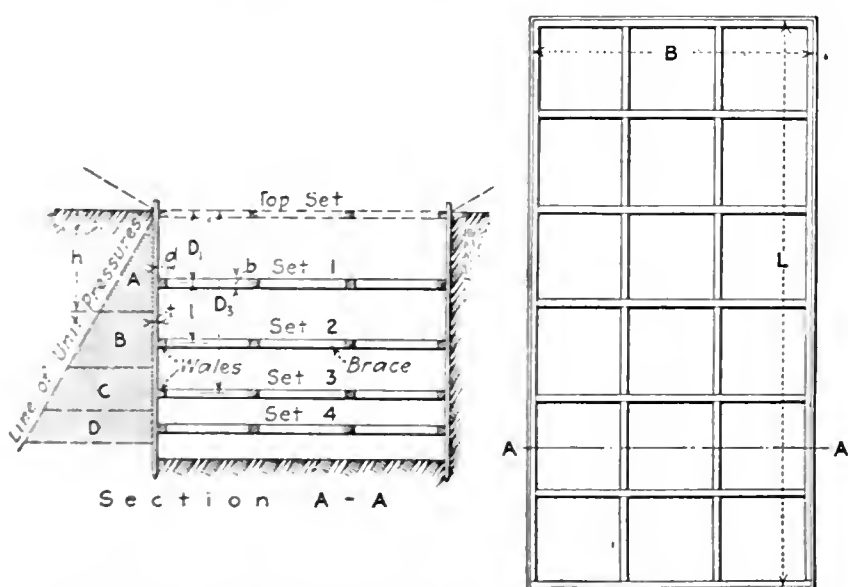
PLAN SECTION AND OUTSIDE PRESSURE DIAGRAM OF SINGLE-WALL COFFERDAM
